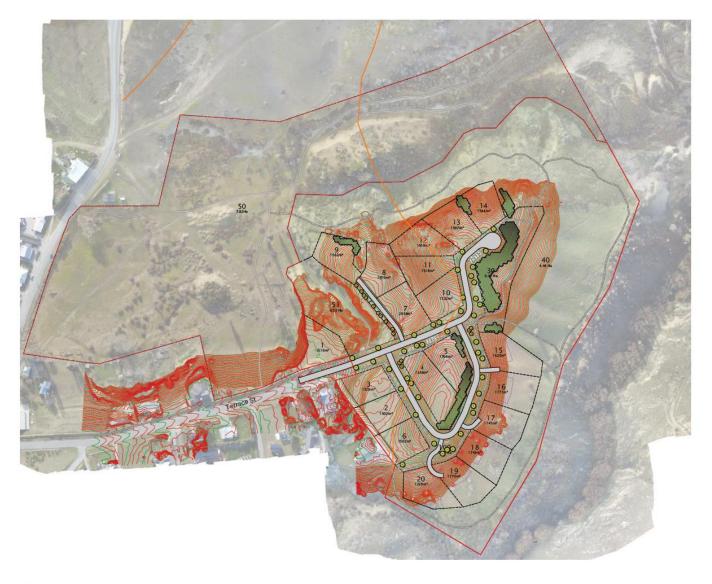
Spatial plan over 2014 LINZ aerial of Heritage Landscape features across Lot 4 & Part Sec 103 & surrounds with Water Race Hill RC2 01 REV C 2023 subdivision layer
